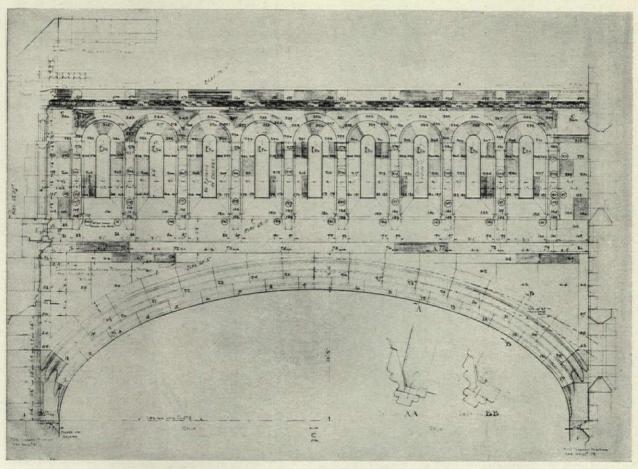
STONE COMPANY'S DRAWING FOR BRIDGE, YALE ART MUSEUM MADE FROM ARCHITECT'S DRAWING SHOWN OPPOSITE
